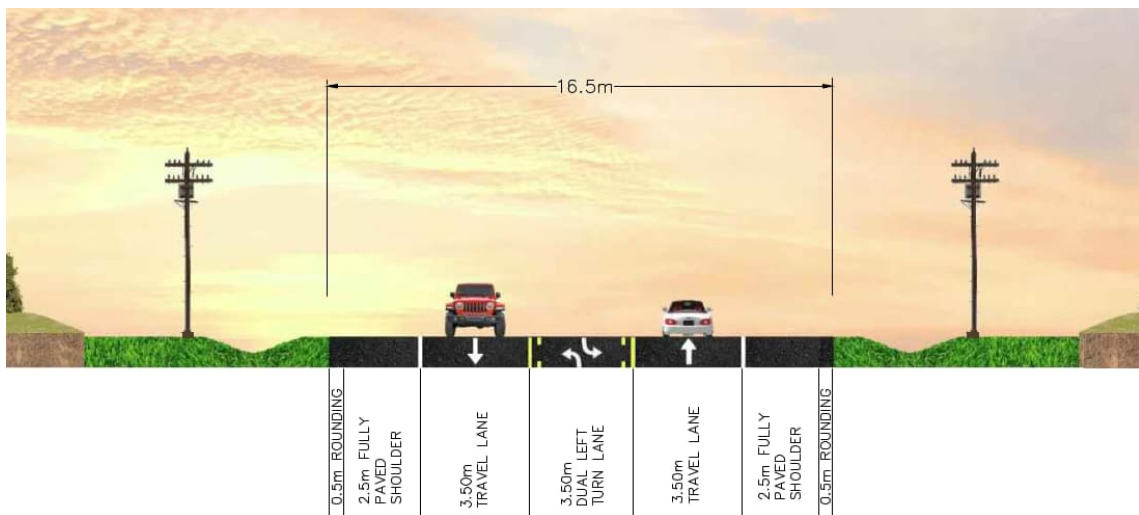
Widen About the Centreline with a Rural Cross-Section
